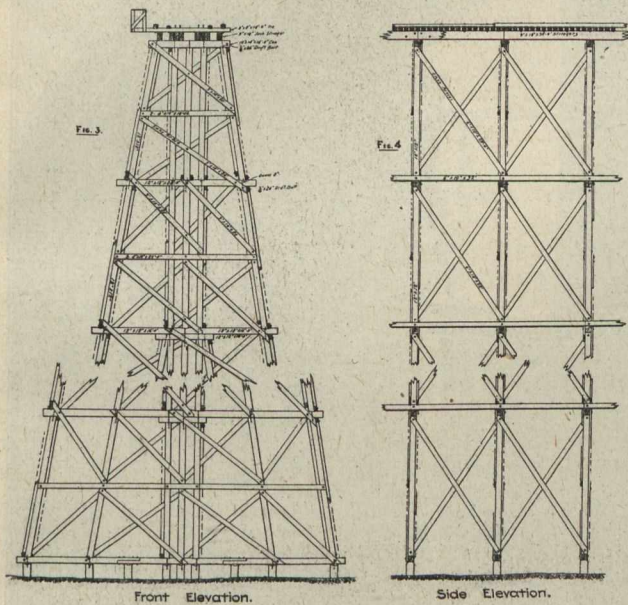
represents a general plan of a wooden trestle as generally built. This style has a batter of two inches to the foot (one in six). It has intermediate cap sills and sill. Notwithstanding that this plan is faulty in many details, it has the approval of two great corporations in Canada. It has not
